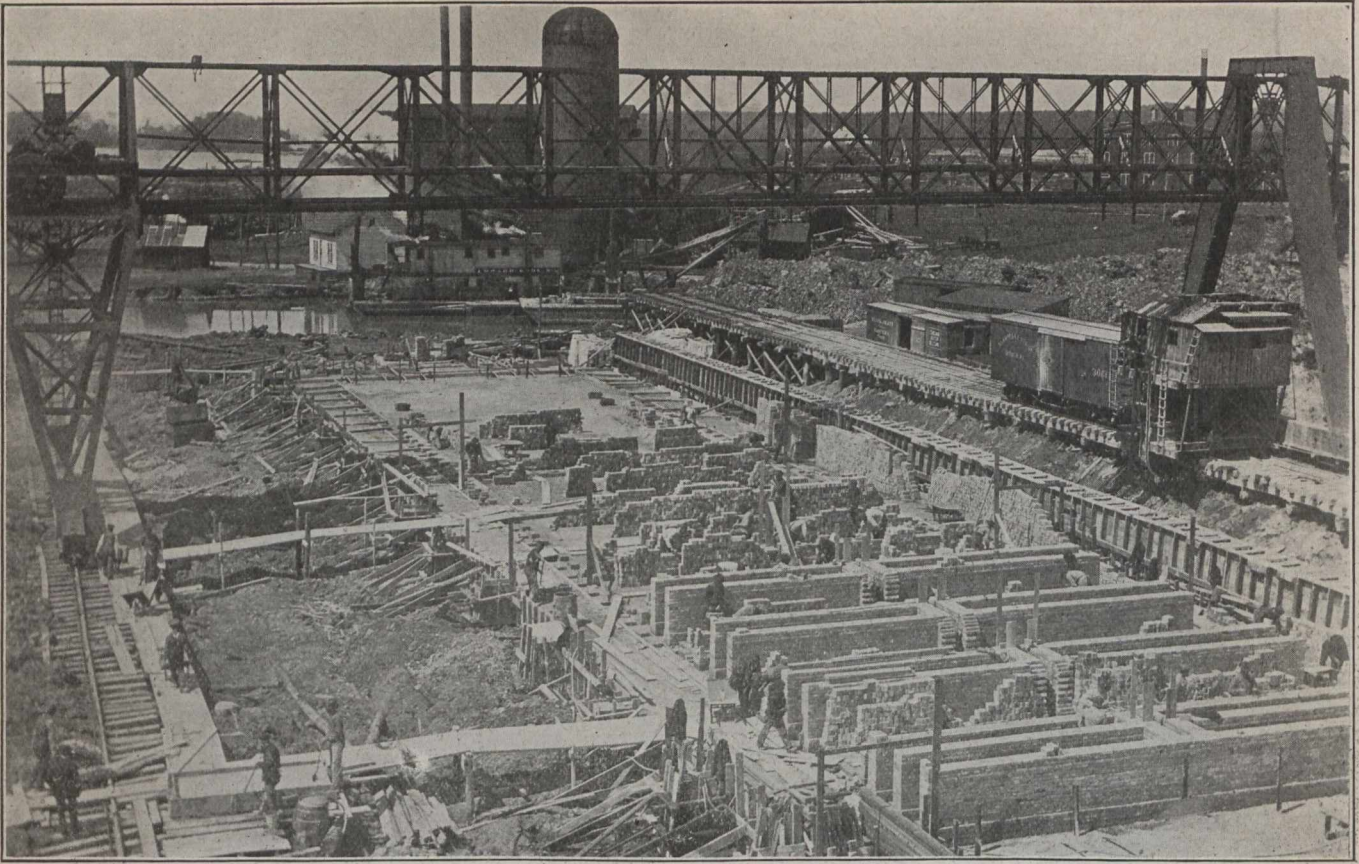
Oven Foundations and Chimney Flues to Stack, with Brick Work on Regenerator Walls under way.
